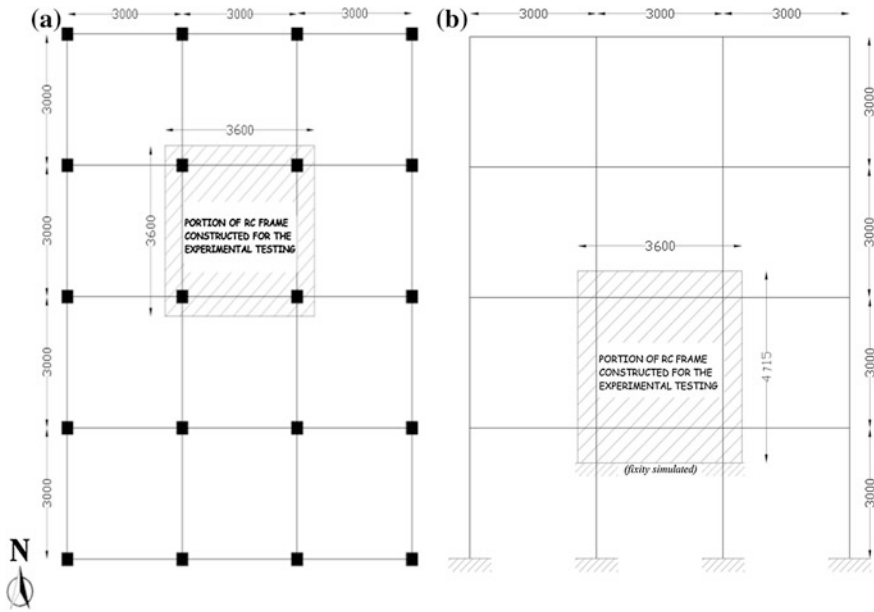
G + 3 RC frame structure a in plan, b in elevation
